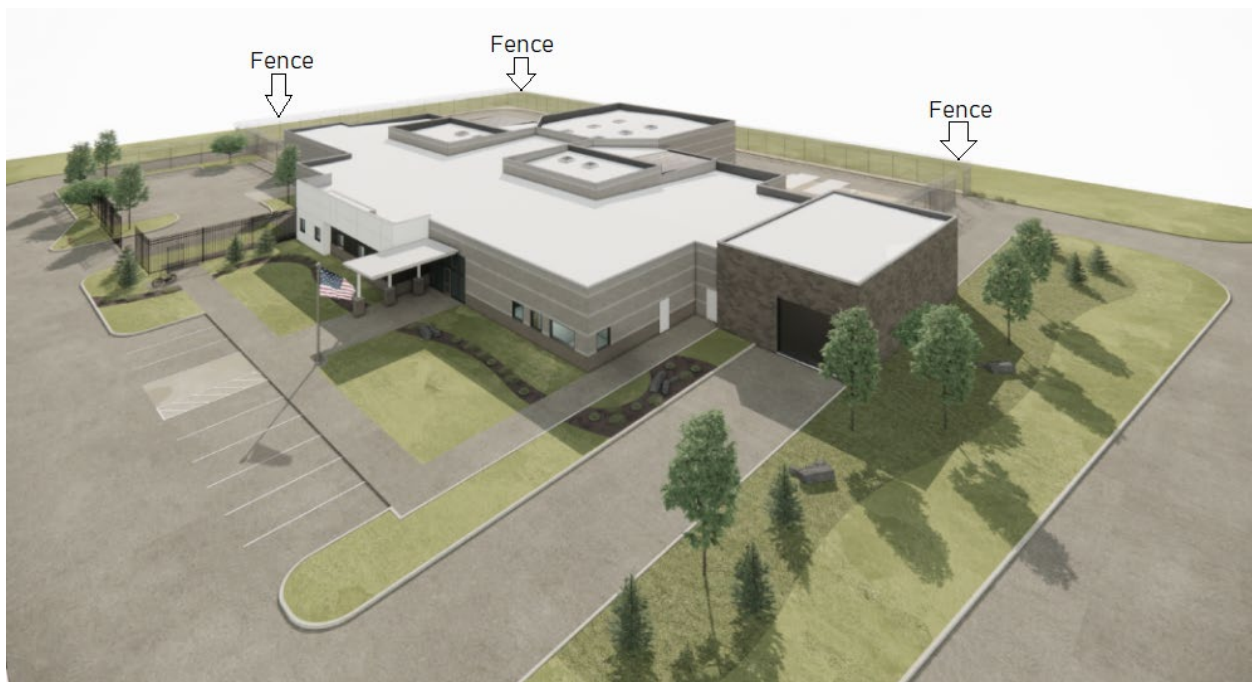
AERIAL RENDERING, SHOWING PROPOSED FENCE
